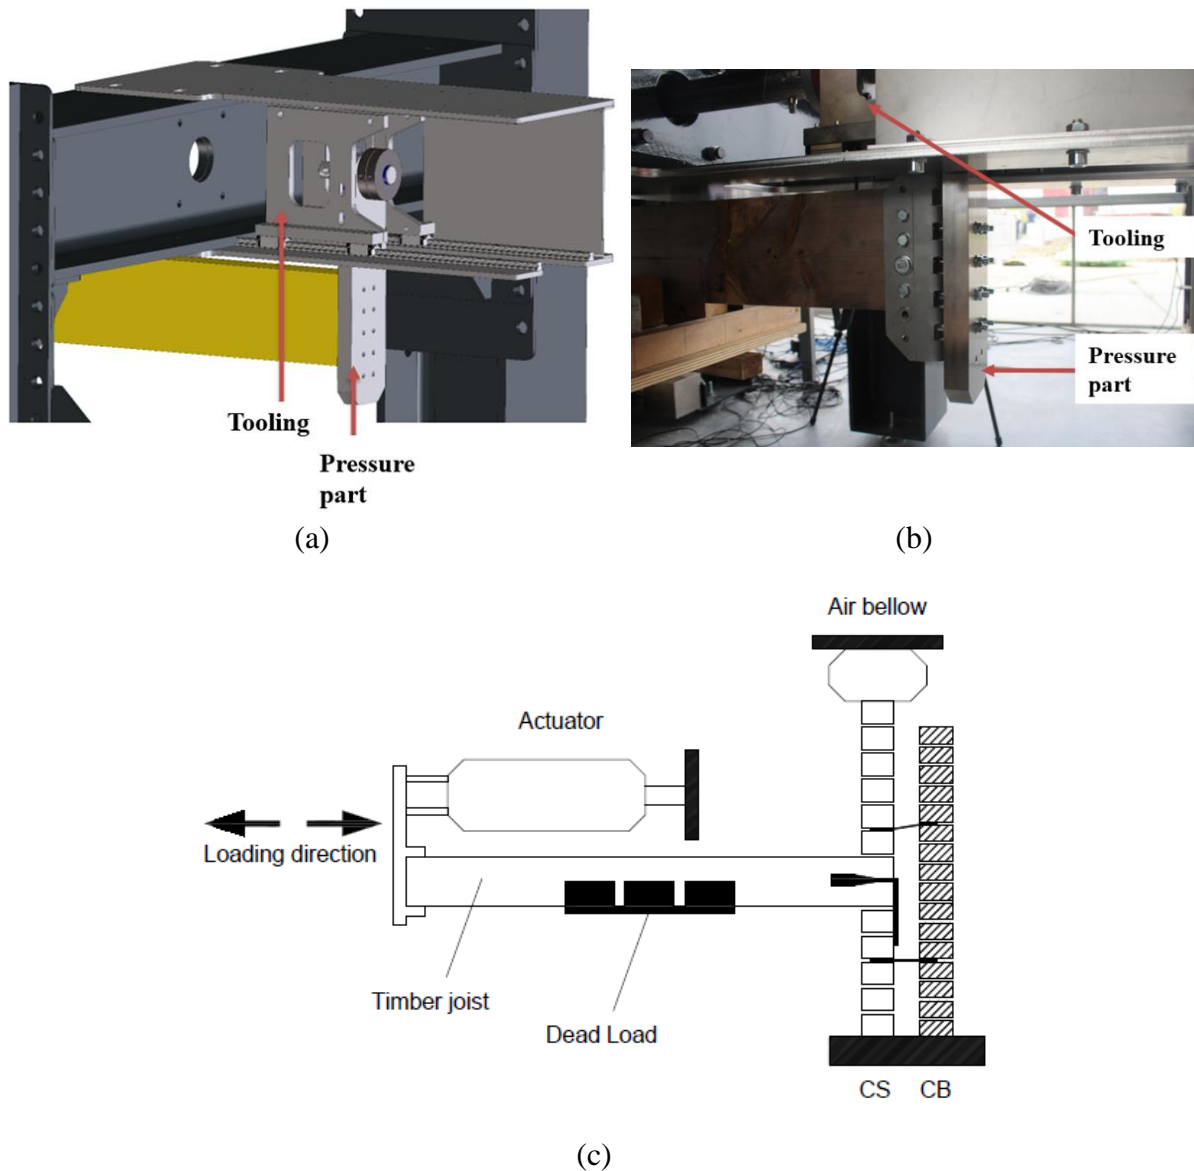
Tooling configuration for connecting the actuator to the joist with the test setup: schematic view of the tooling configuration (a) and photograph (b), and schematic view of the test setup (c).
